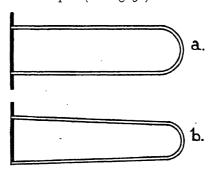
Calorifier Tubes: (a) U Tube; (b) Hairpin Tube.
